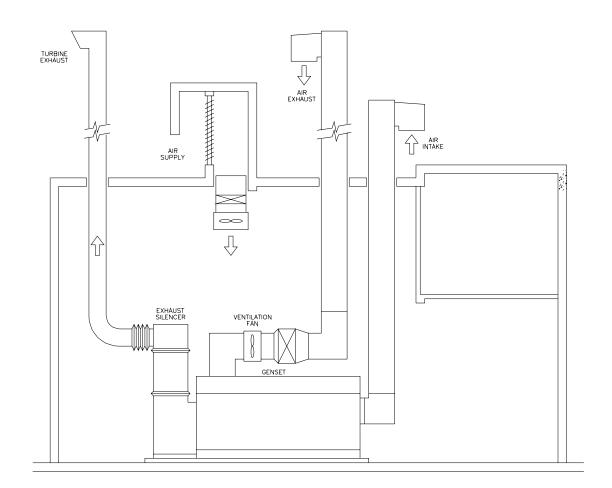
Gas Turbine Generator Air Intake And Exhaust Component
